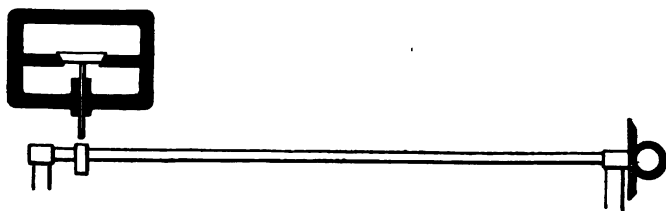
VALVES OPERATED BY BEVEL GEARING.
